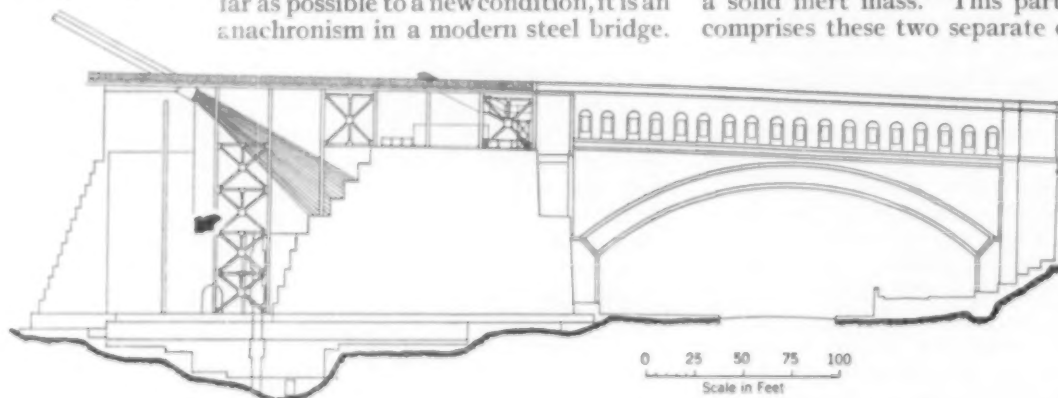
PRESENT CONDITION OF EAST ANCHORAGE, GEORGE WASHINGTON BRIDGE
